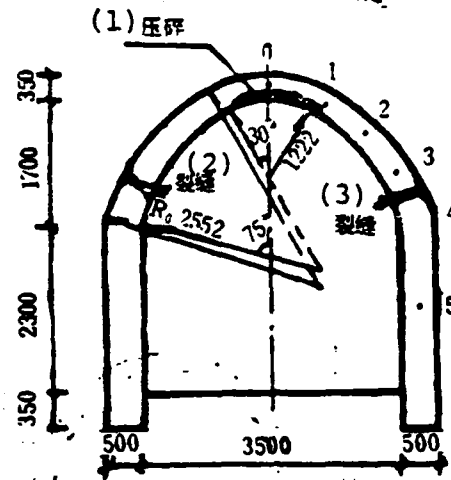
Constructed tunnel dimensions and destruction areas.
